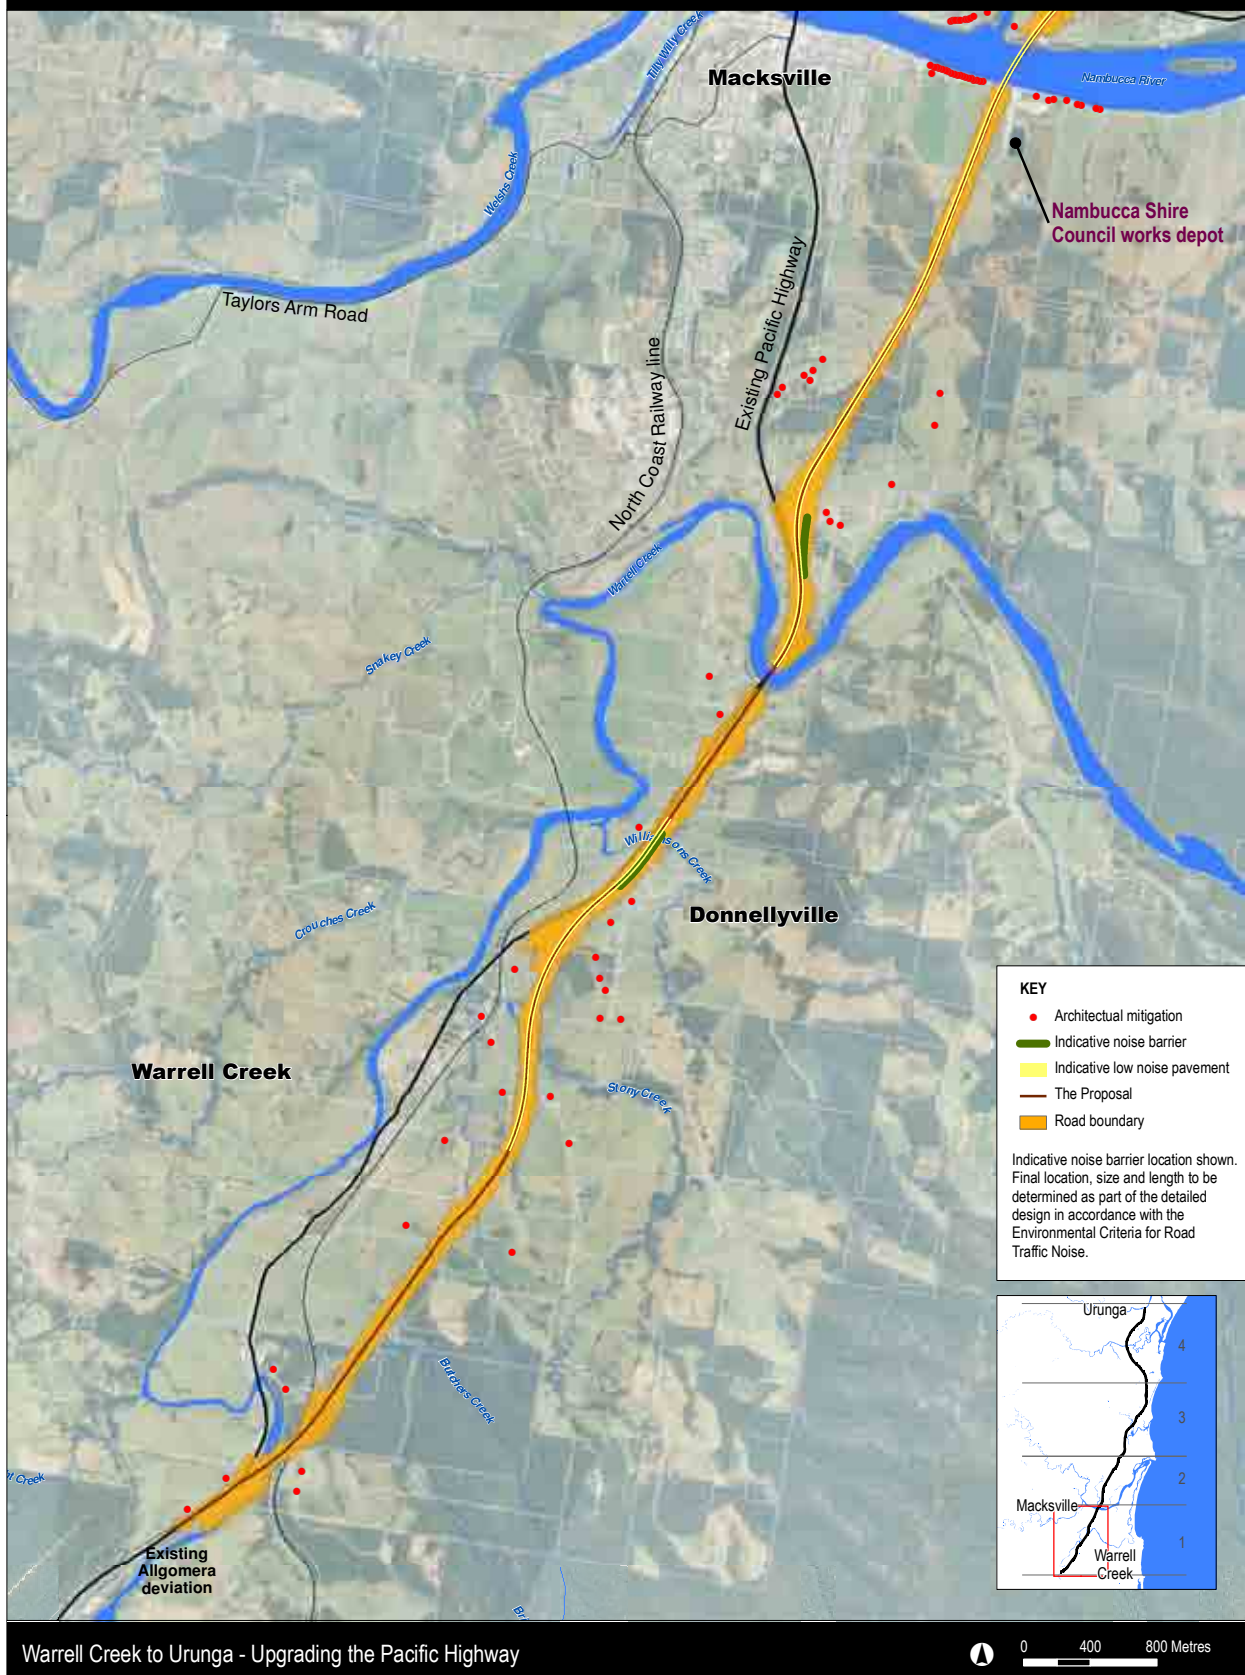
| LOW NOISE PAVEMENT AND NOISE BARRIER LOCATIONS
